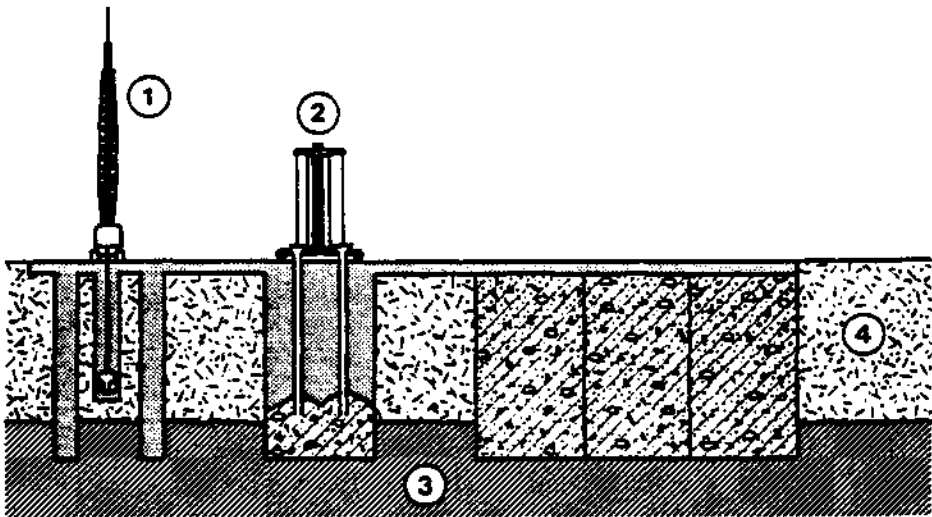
Diaphragm wall cutoff, 1) excavation; 2) concreting; 3) substratum; 4) permeable layer (ICOLD 1985).
